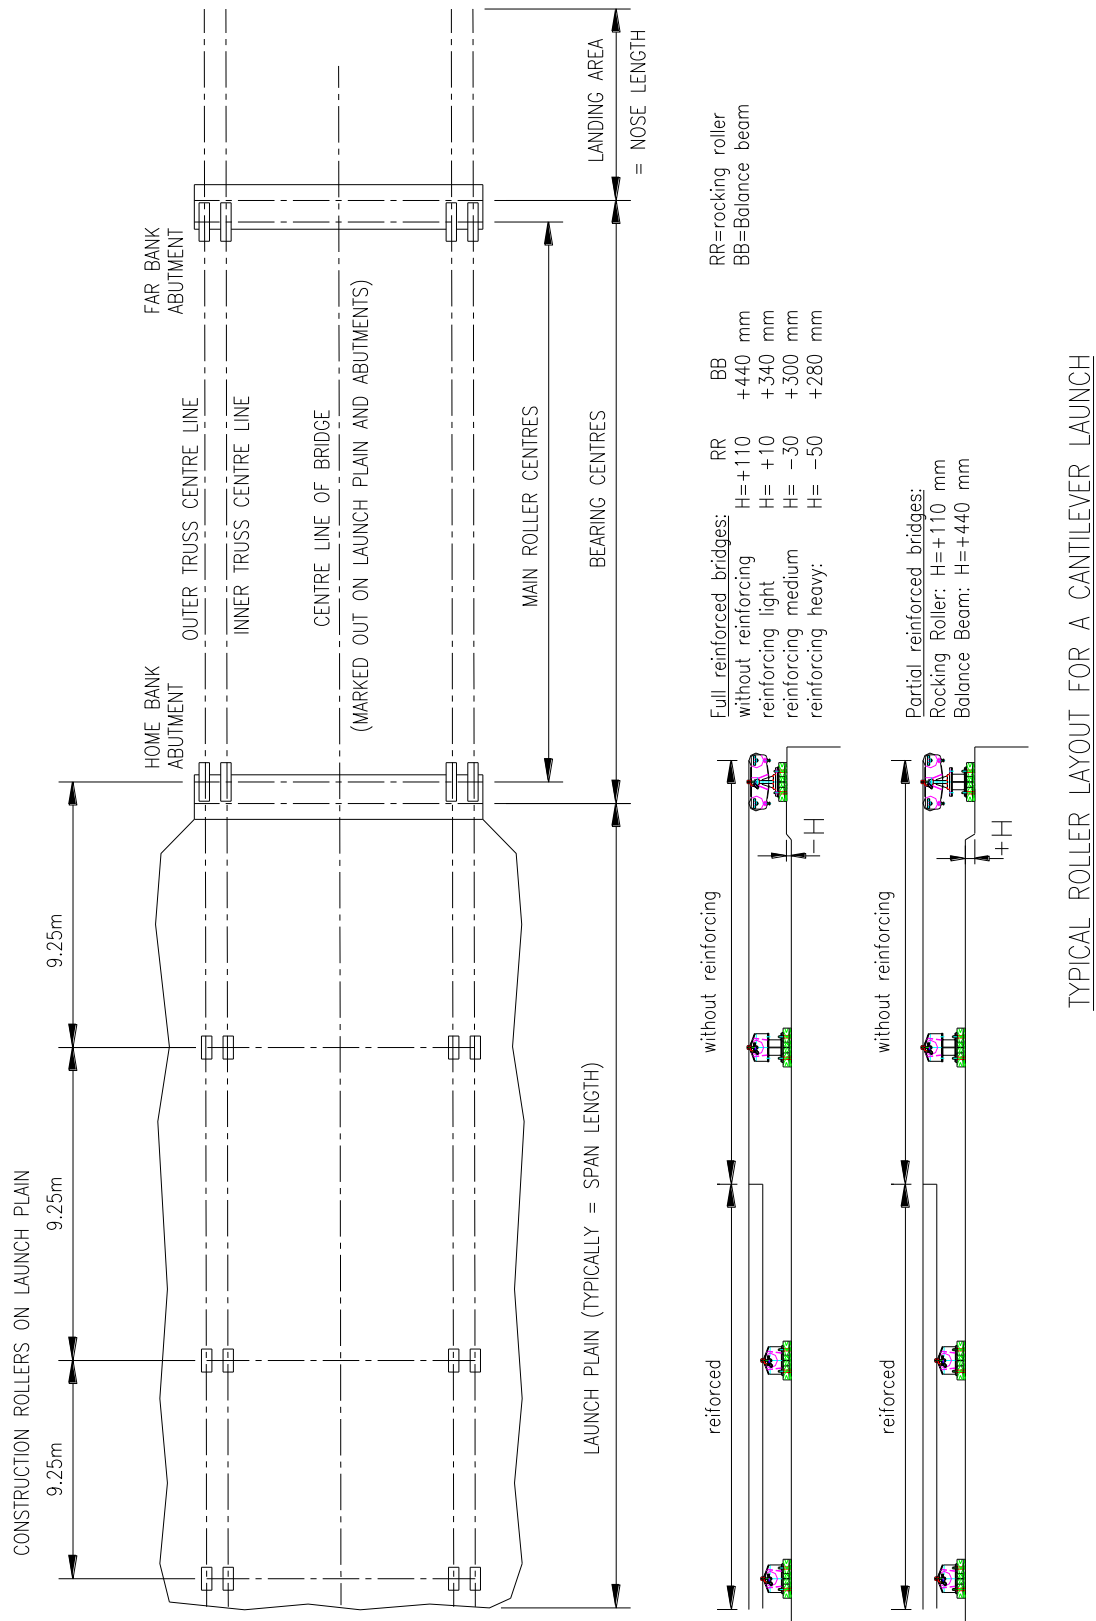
TYPICAL ROLLER LAYOUT FOR A CANTILEVER LAUNCH
